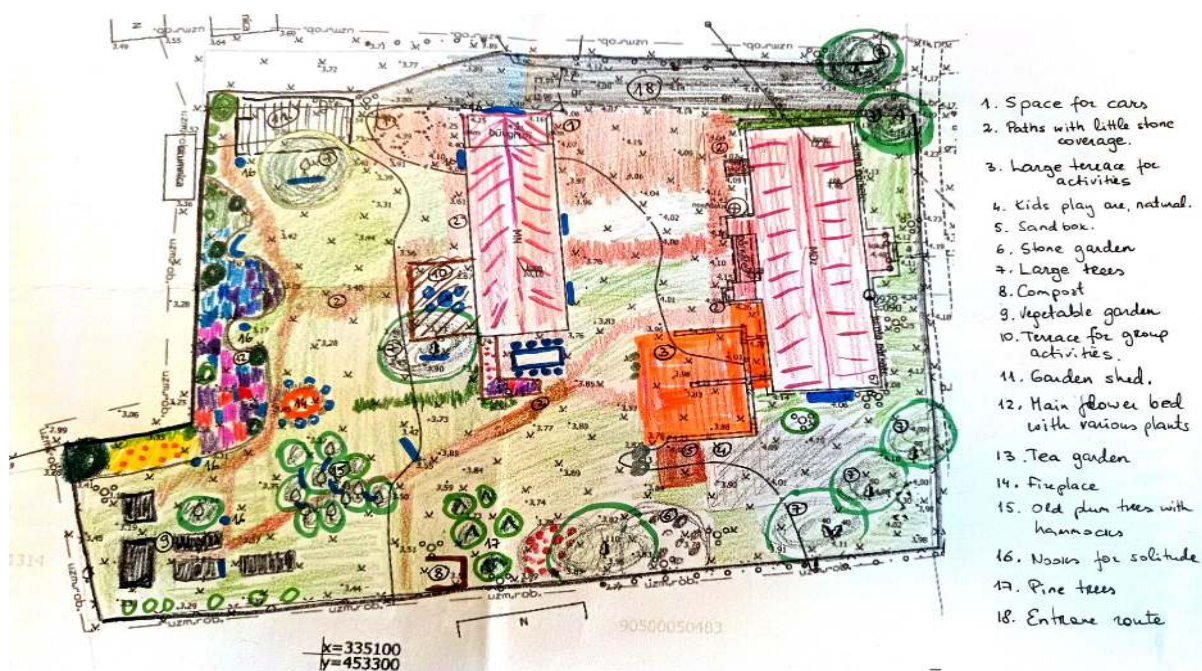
Healing garden in Engure, Latvia layout plan. Author, E.Millere, 2025
